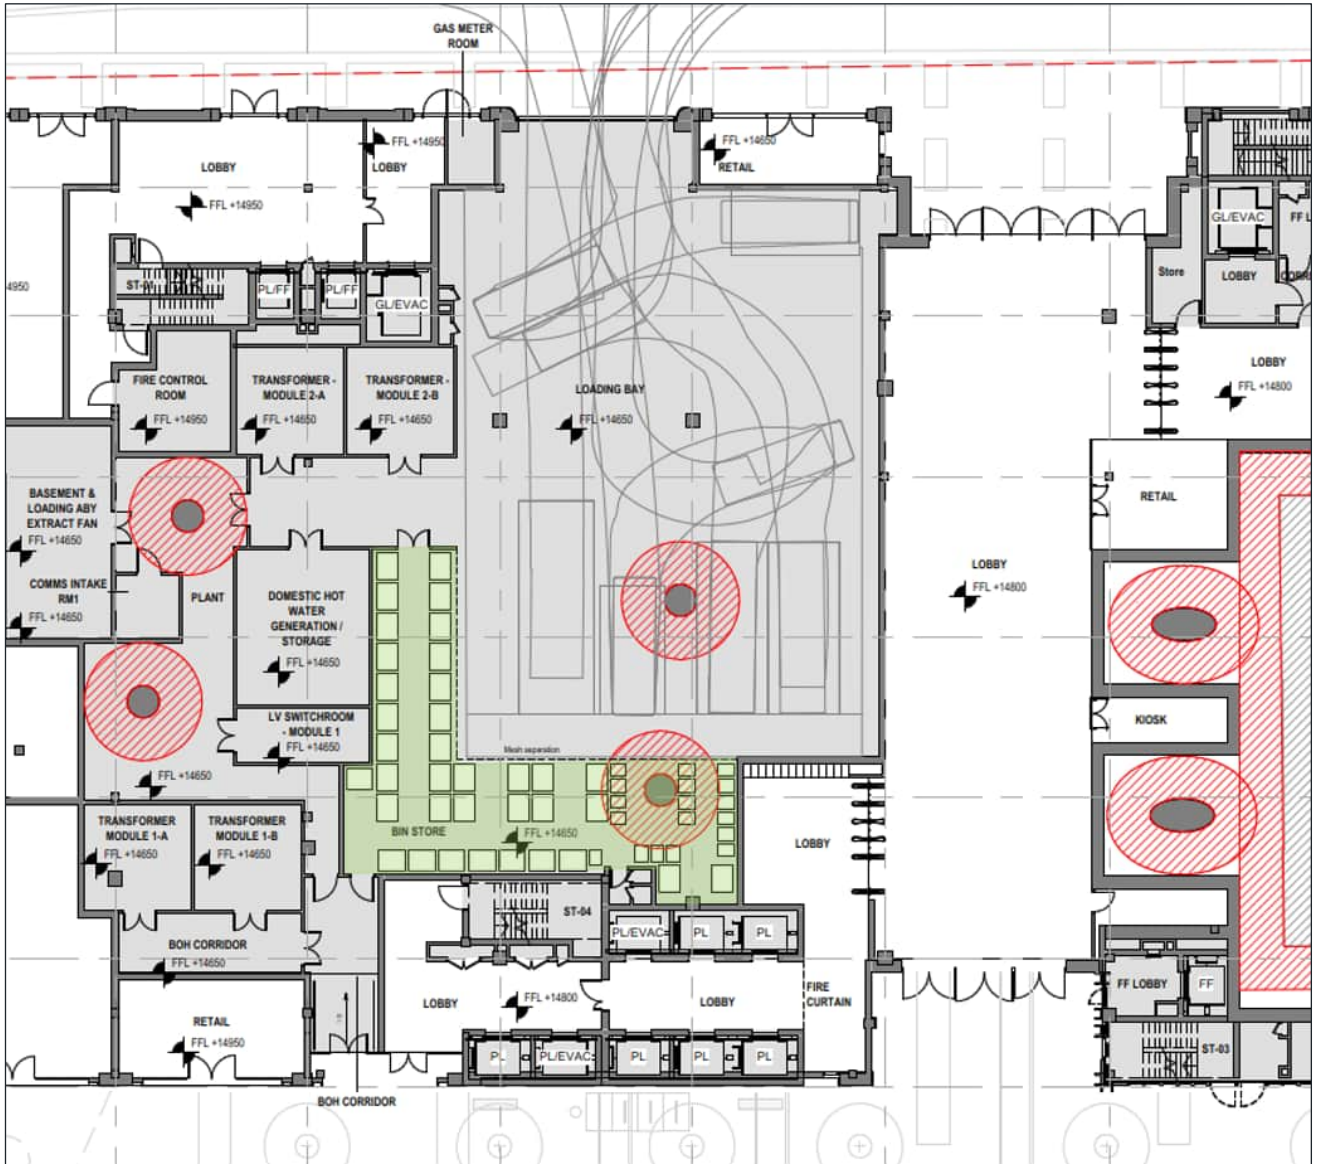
Waste Store Room at Ground Floor Level south of the Service Yard
